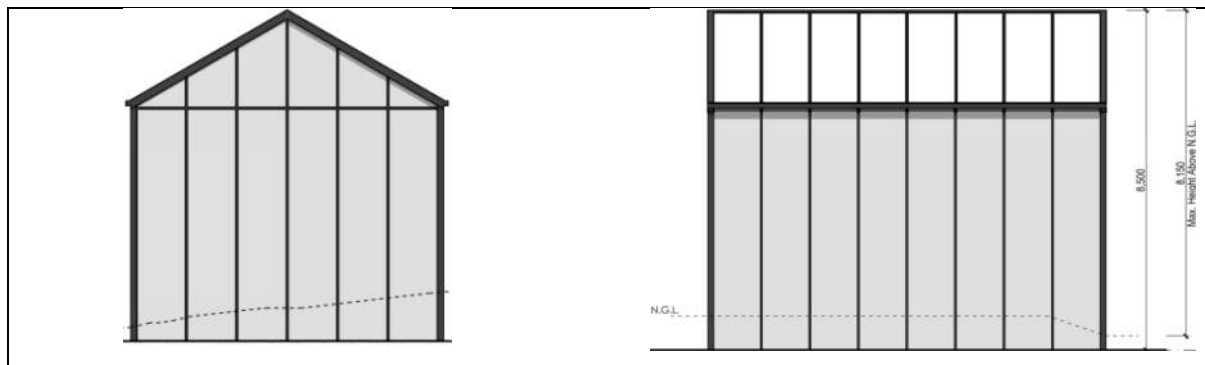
Elevations – North (right), East (left) – Glass House. Source: Coactive Building Design
